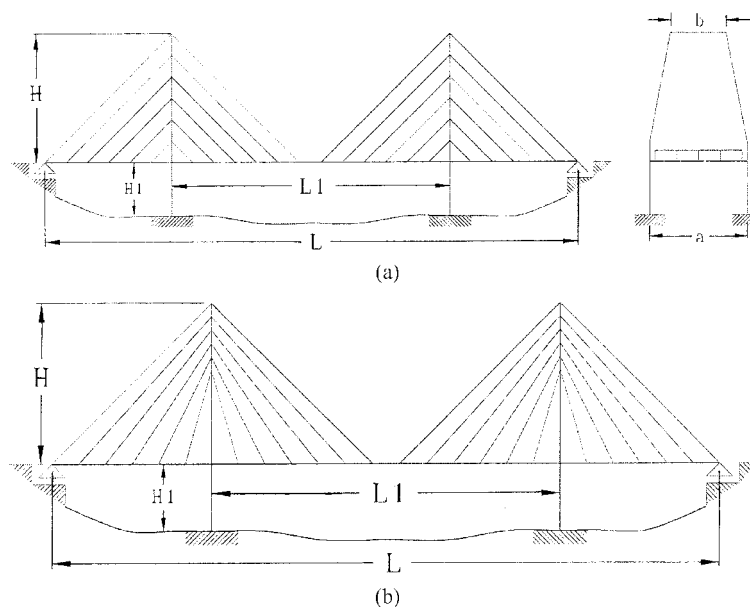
(a) Geometry of harp-type cable-stayed bridge, (b) Geometry of fan-type cable-stayed bridge
